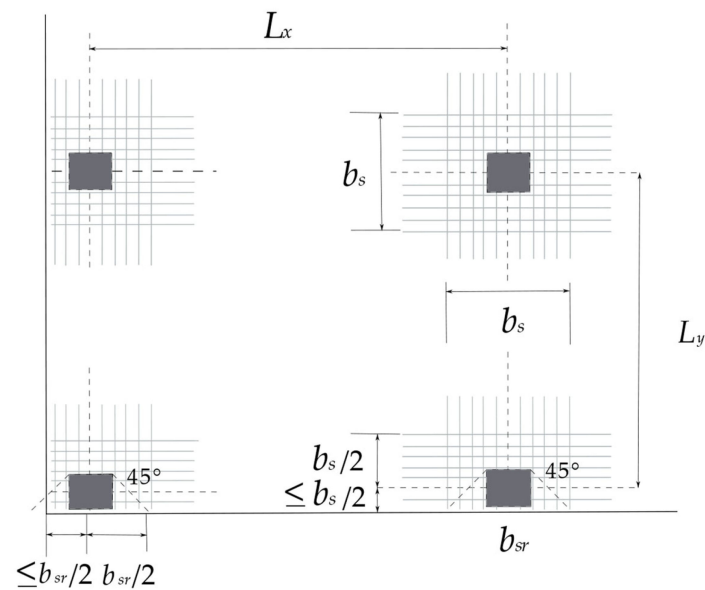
Slab dimensions and support strip dimensions, modified from Ref. [9].
